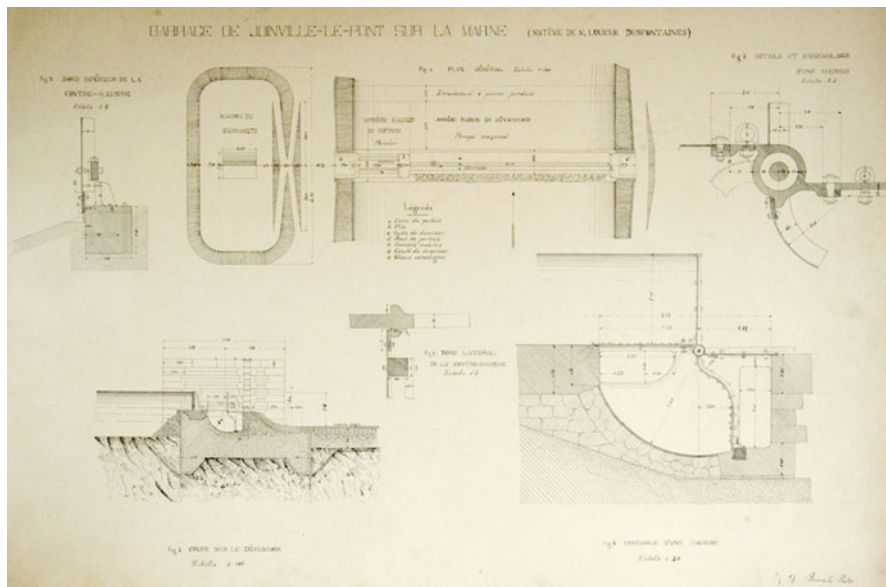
General configuration of a plant, with some constructive details (1901)
